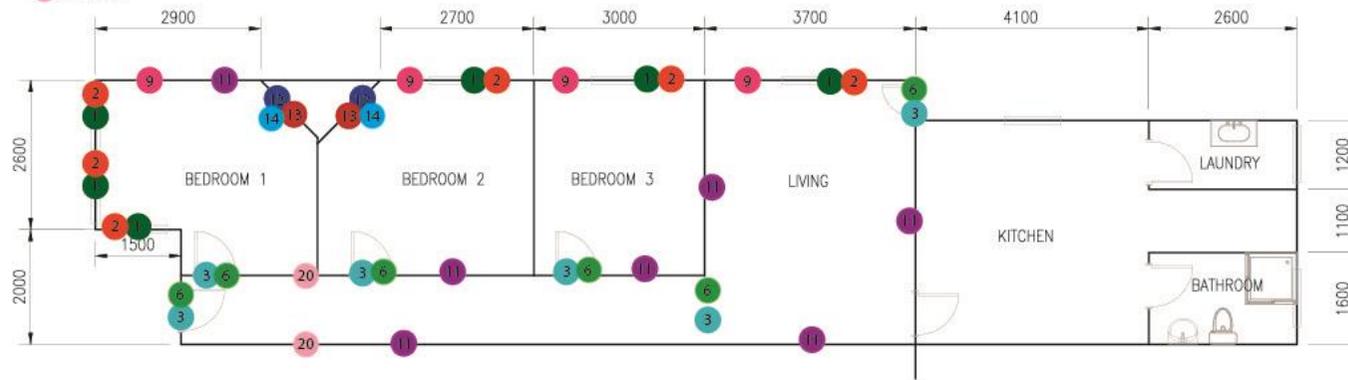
Salvage plan of Exterior of 264 Victoria Road, Rozelle.
